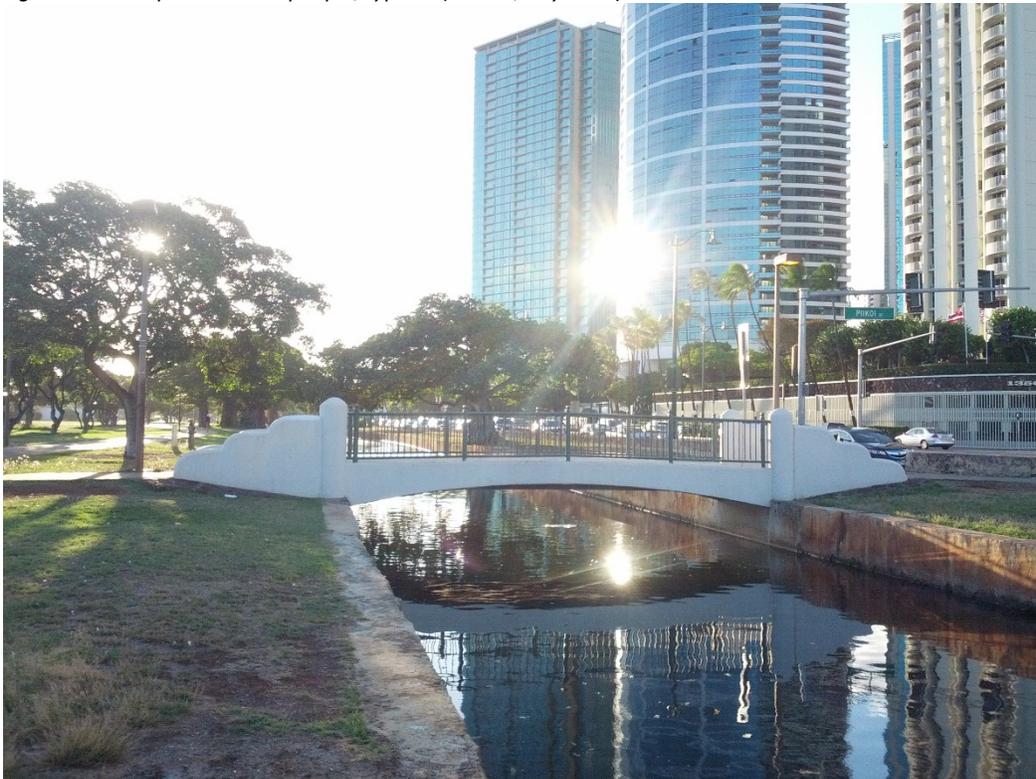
Bridge, facing west. Piikoi Street and Ala Moana Boulevard intersection (right). Luxury condominiums in background. (K. Kido, July 2014)
